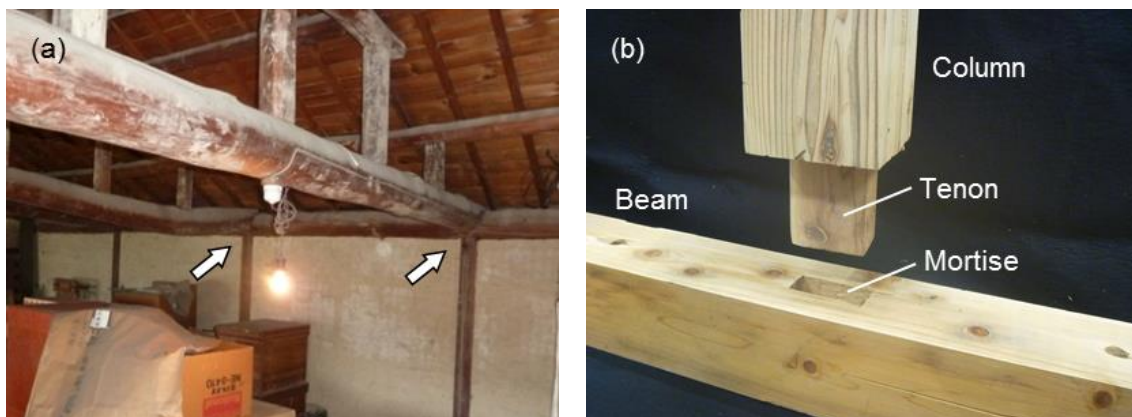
(a) Mortise-tenon joints in wooden buildings. (b) Shape of mortise-tenon joint.
